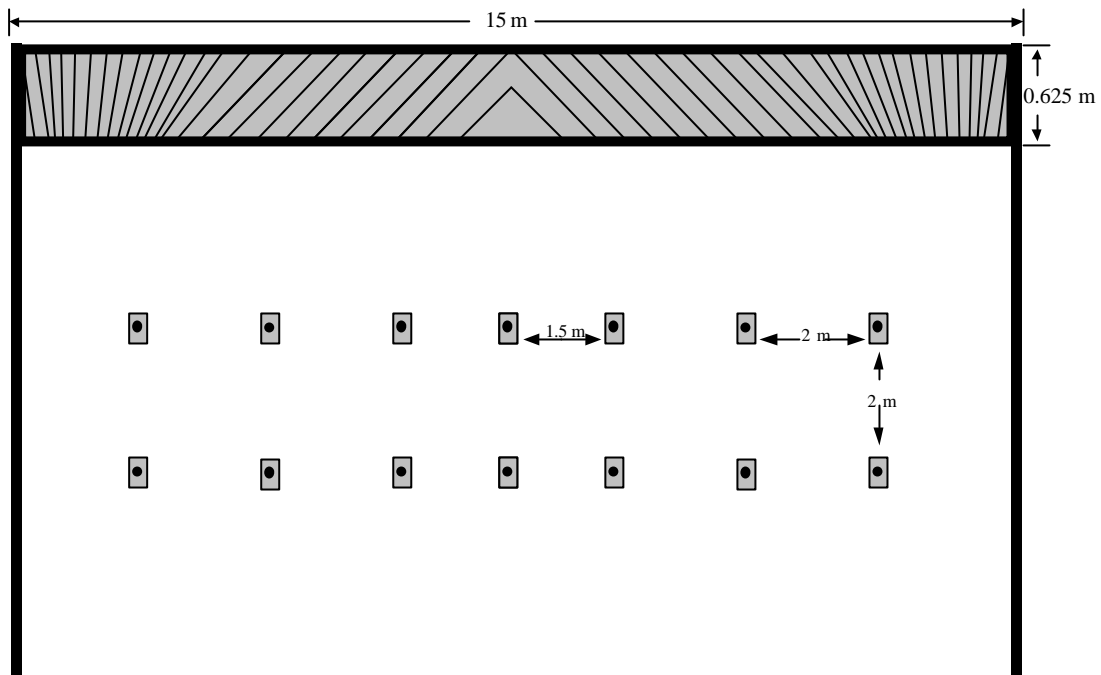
Drilling and blasting panels for 15m panels .
